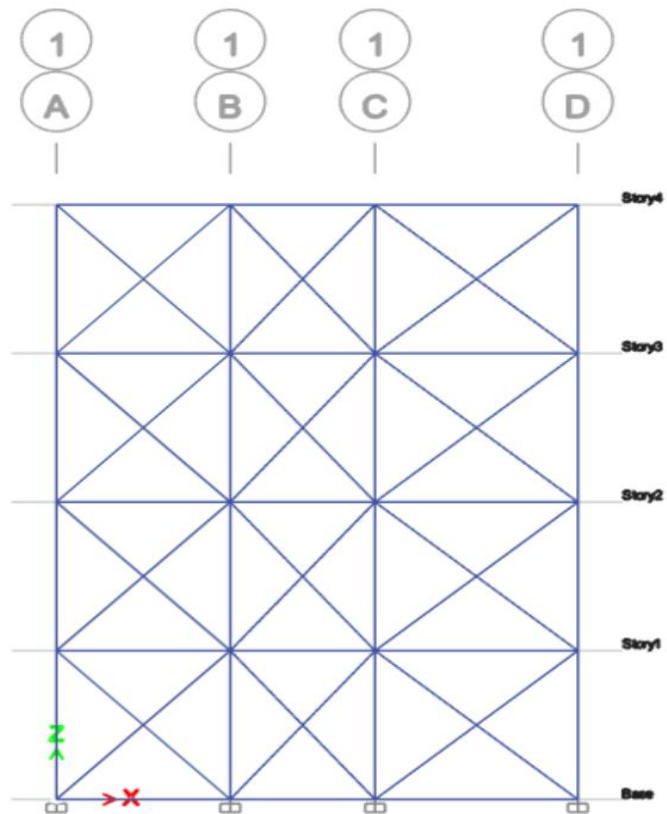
Elevation view of CMS with wall modeled as a cross diagonal strut
